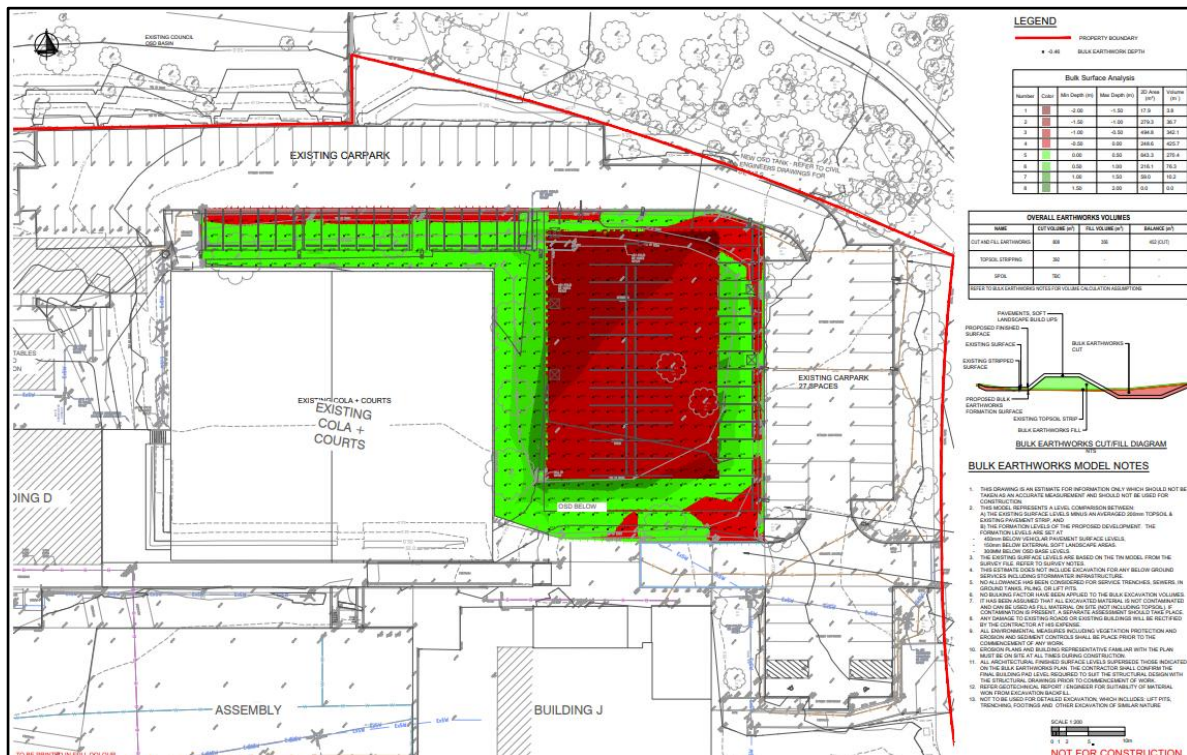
Northeastern Carpark Indicative Bulk Earthworks Plan (Source: Enstruct)
